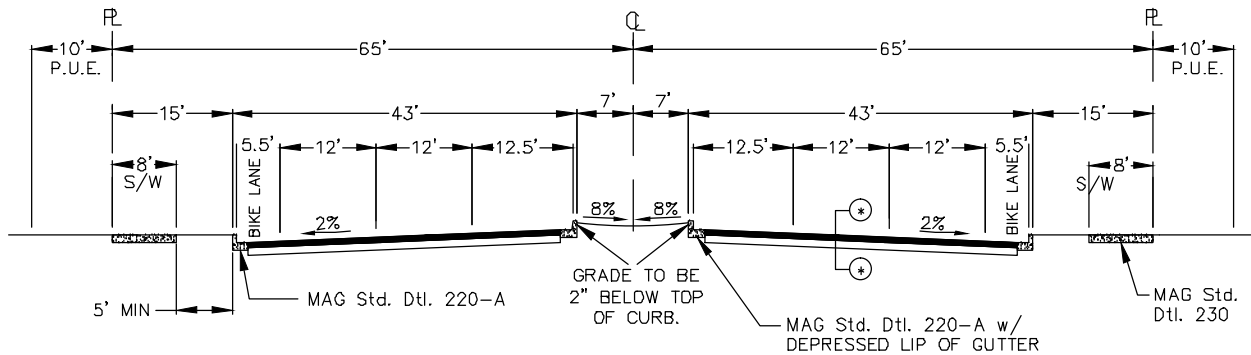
CITY OF GOODYEAR STANDARD DETAIL	APPROVED:08/17	CITY CENTER & SCENIC ARTERIAL STREET CROSS SECTION	DETAIL NO. G-3120
